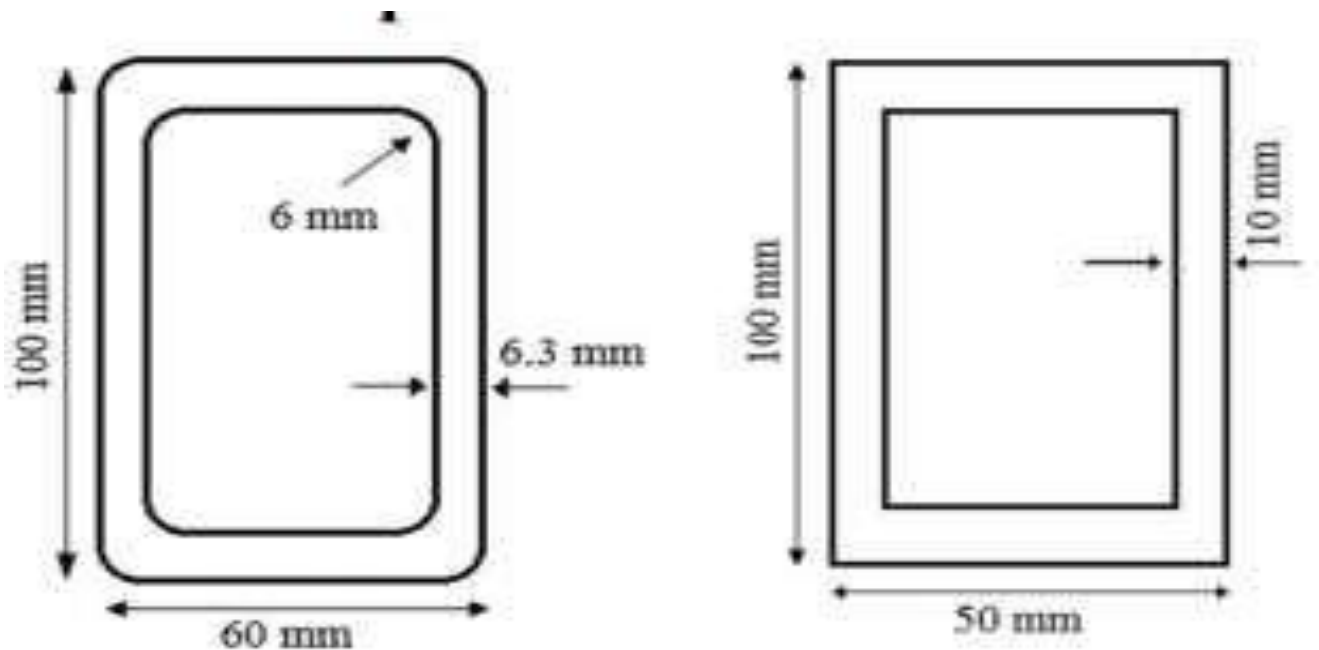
(a) Rectangular Tubular Cross section; (b) Rectangular Cross section
